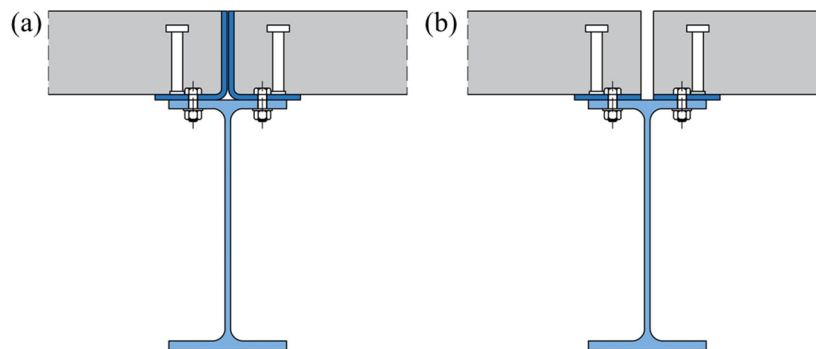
Demountable connections with discontinuous slabs over the beam:
